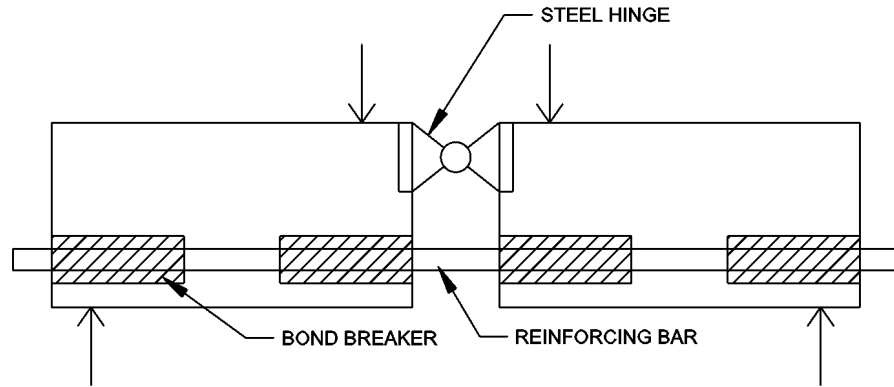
RILEM hinged beam test for bond strength of reinforcing bars (RILEM 1994)
